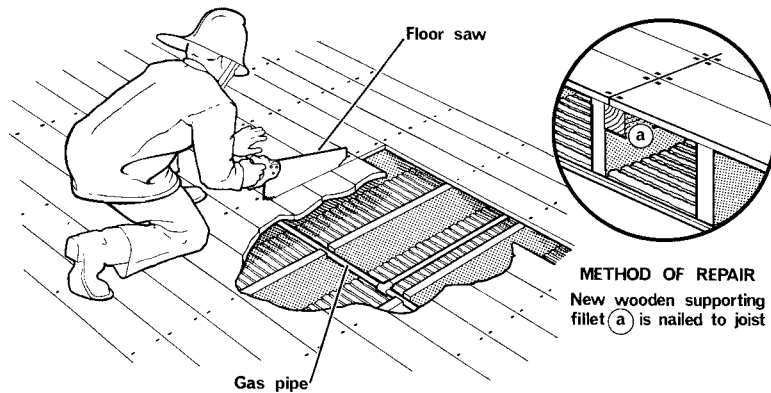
The correct method of cutting a floorboard with a floor saw. Note the danger of cutting concealed pipes. Inset: method of repair which can be used if cutting away has been carried out carefully.
